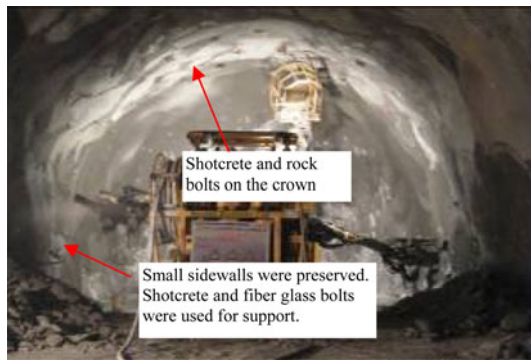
Photo of the excavation and support of the pilot tunnel in the headrace tunnel #3
